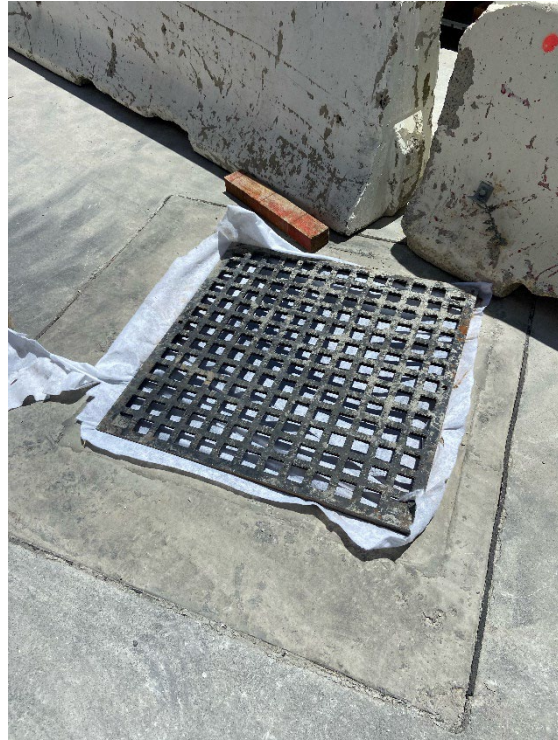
Existing stormwater pit of new site access Gate A, which had a piece of geotextile fitted beneath the grate during the time of the site audit.
